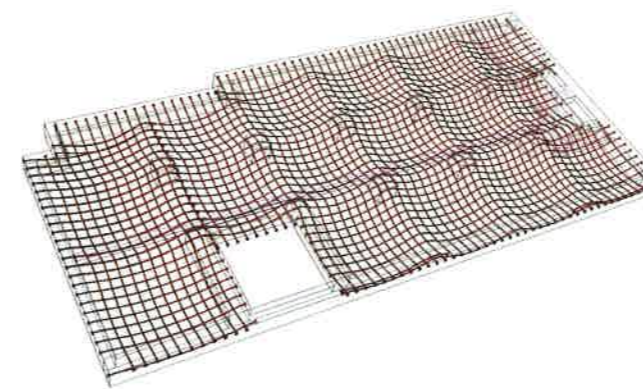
Stairwell Opening Created at Center of a Post-Tensioned Panel (San Francisco, courtesy SGH)
